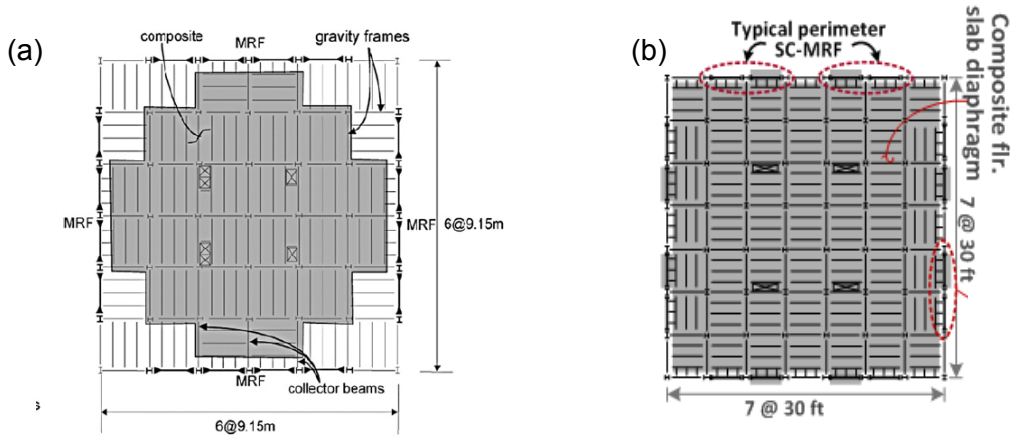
Floor diaphragm systems for buildings with perimeter SC-MRFs: (a) composite floor slab with flexible collector beams; (b) composite floor slab attached to one bay of each SC-MRF
